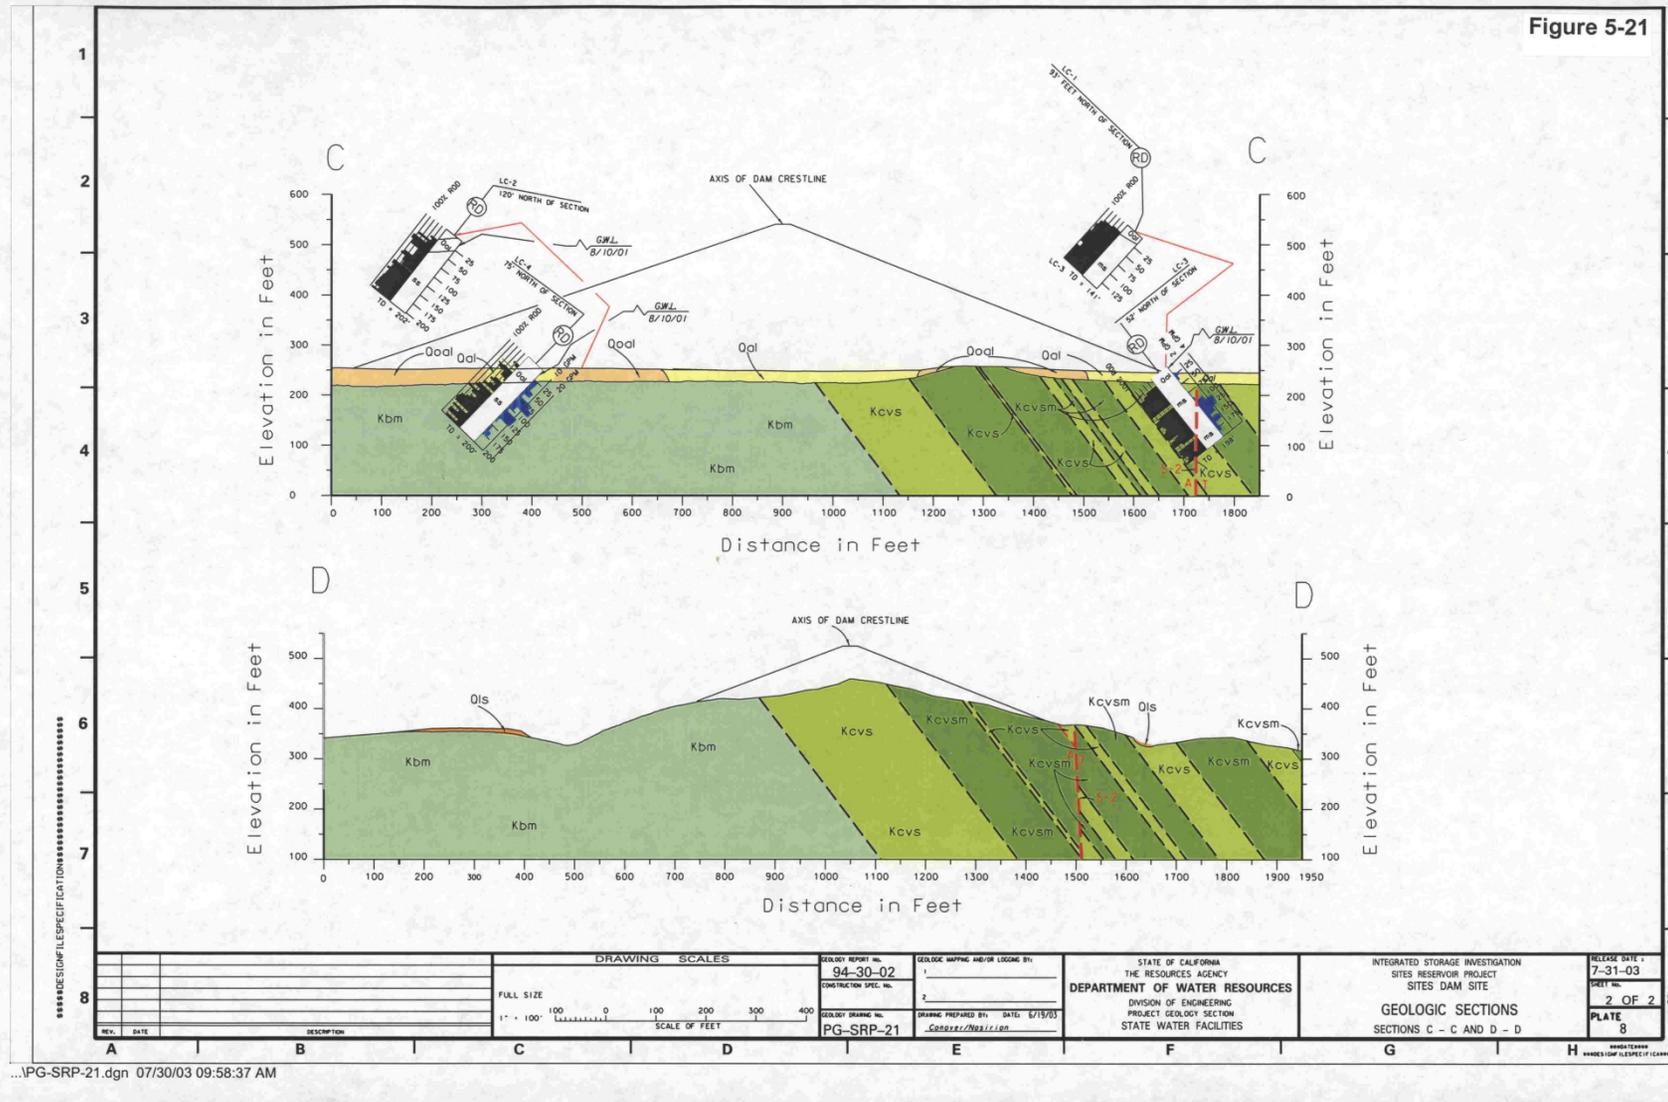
Sites Dam Site – Geologic Sections – Sections C-C and D-D
